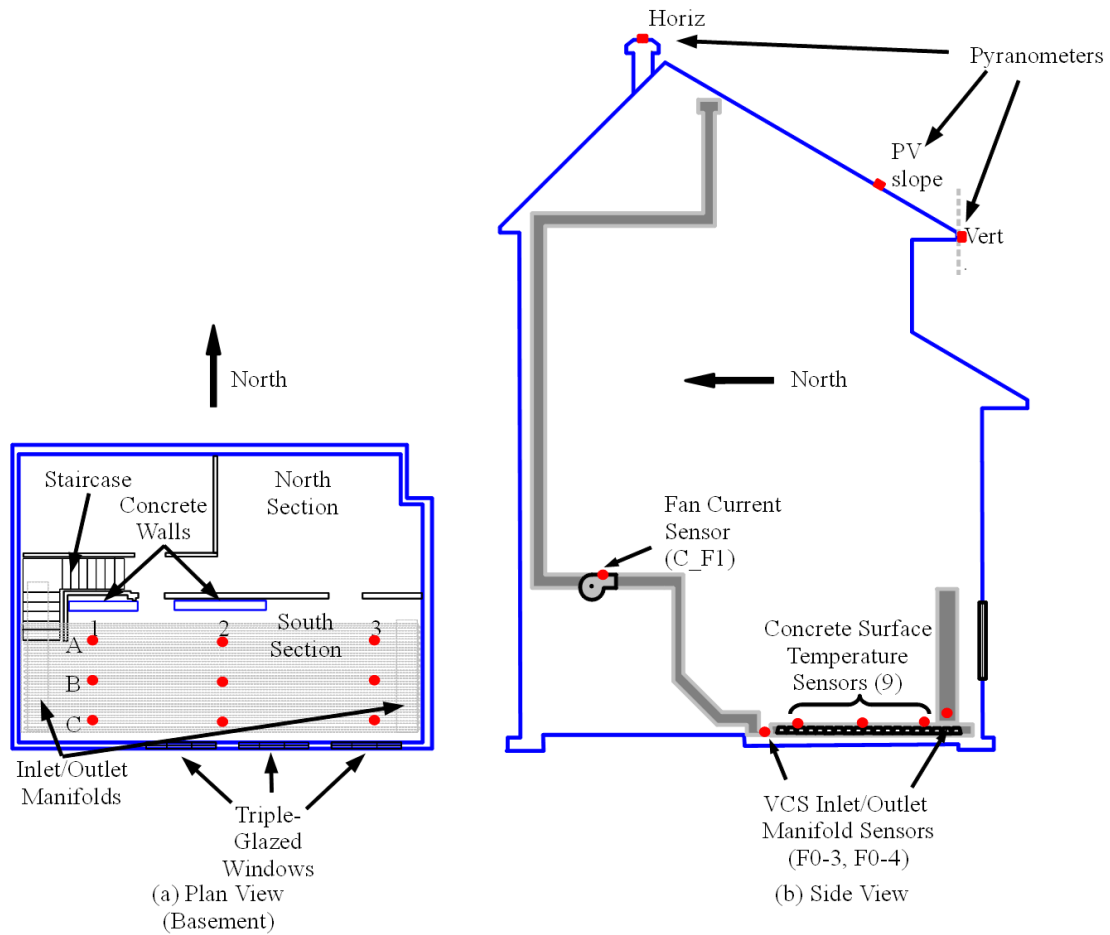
(a) Basement floor plan with location of the nine ventilated concrete slab surface temperature sensors. (b) Side view of the Ecoterra™ house with location of sensors.
